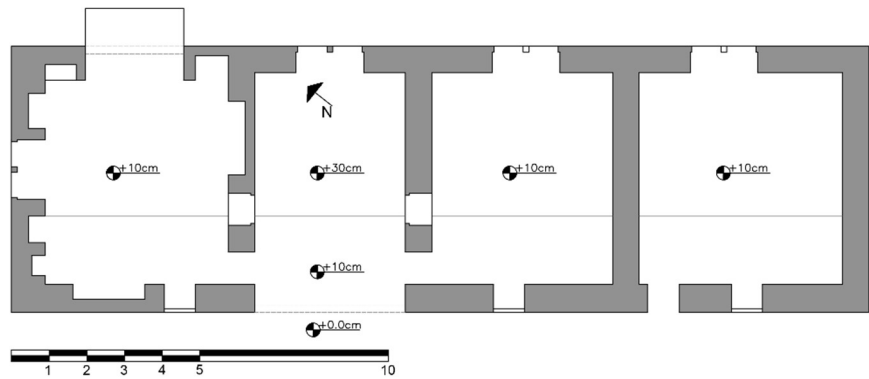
(b) Plan of Abey Liwan House, Source: Author
